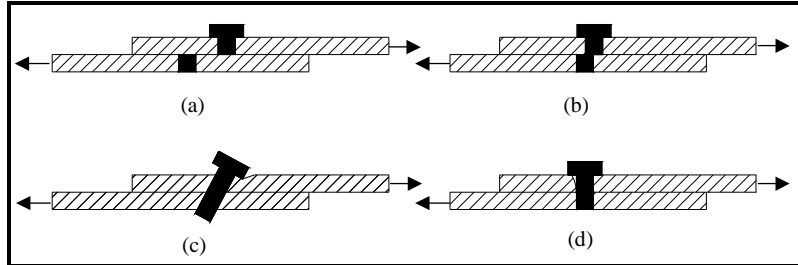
Failure modes for fasteners under shear force. (a) shear of the fastener itself; (b) crushing of the fastener; (c) tilting and pull out of fastener; (d) yield in bearing (tearing of the sheeting)
